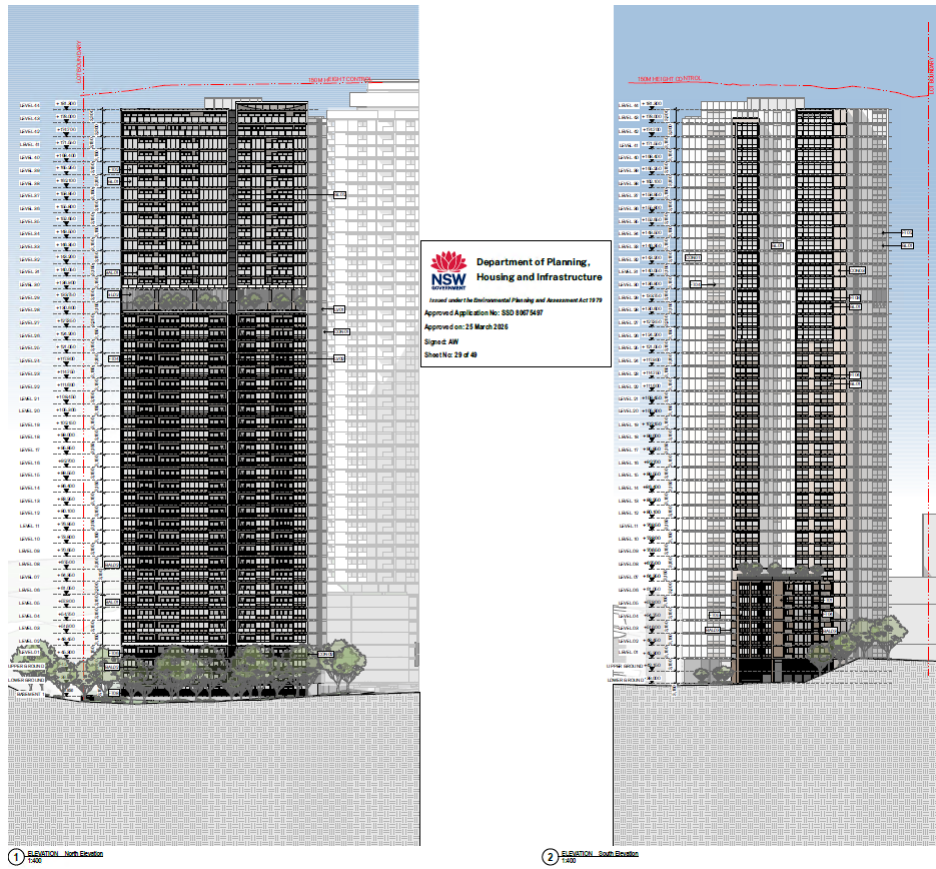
Approved northern and southern elevations - Building A (SSD80675497)
